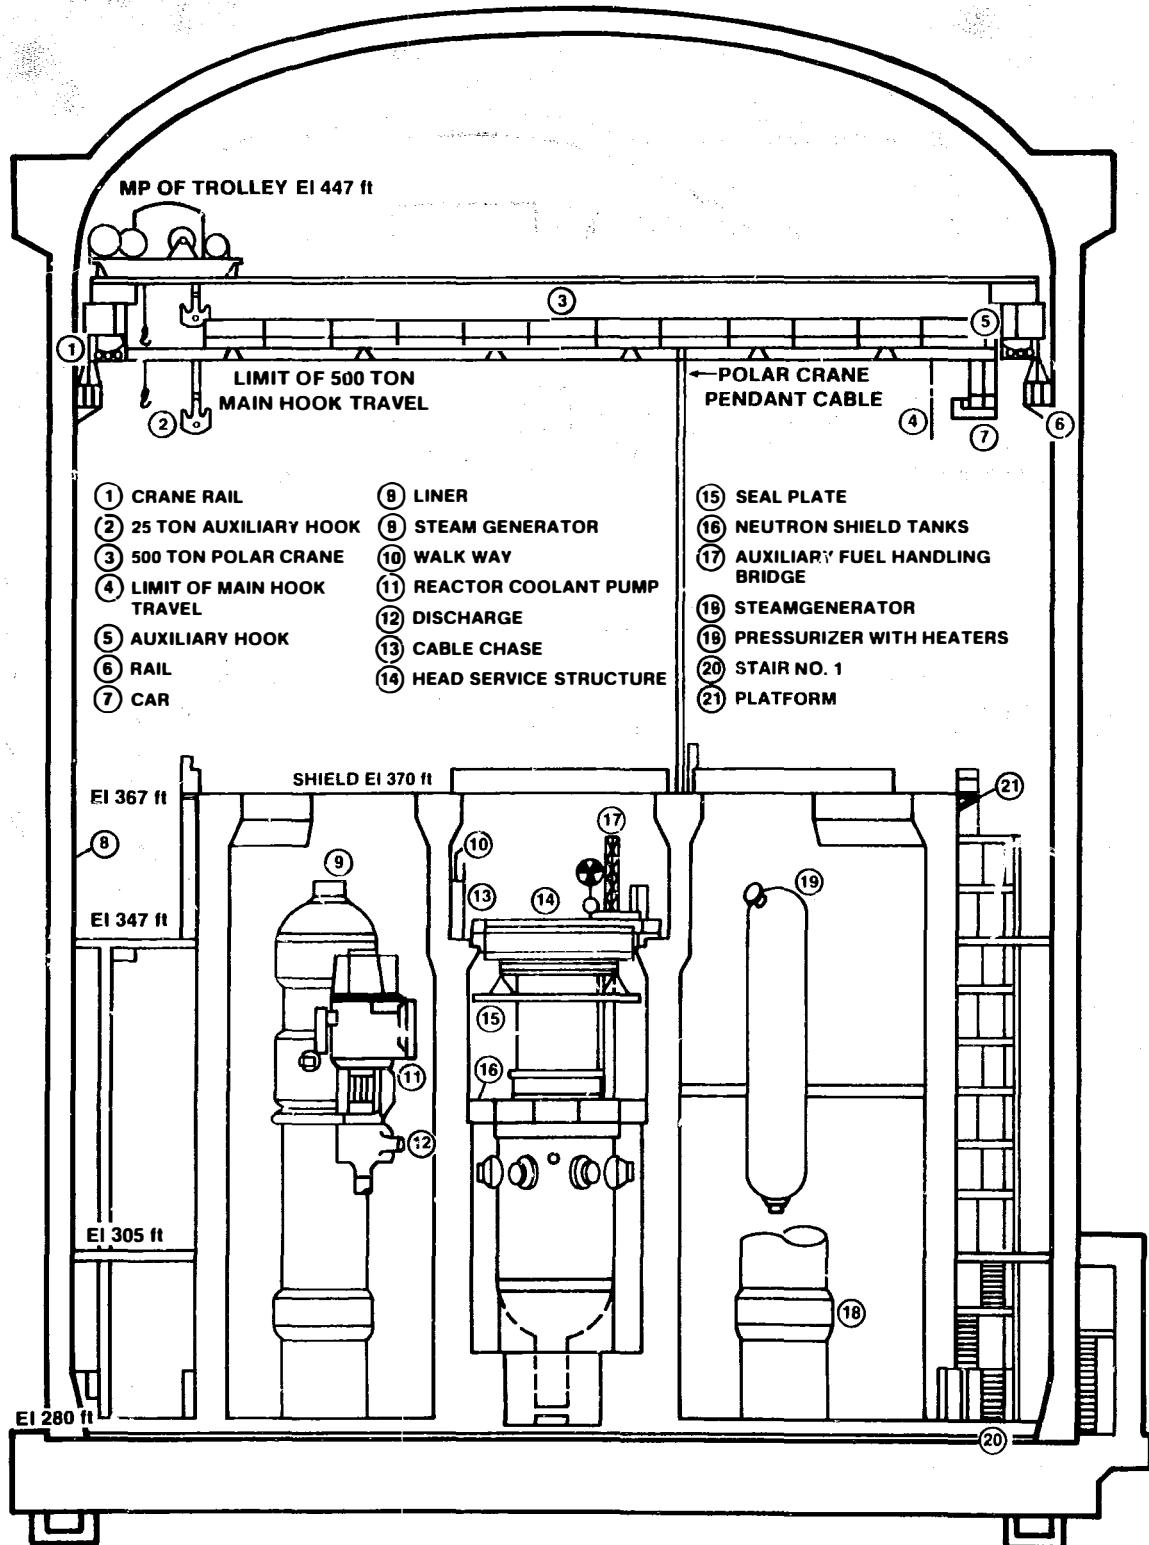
Cross Section of TMI-2 Reactor Containment Building (Looking North to South).
